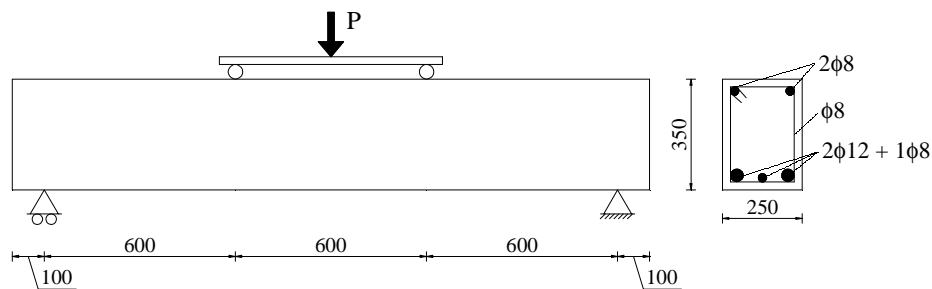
Sketch of the loading arrangement adopted during the experimental test and beam cross-section details [8] (dimensions in mm).
